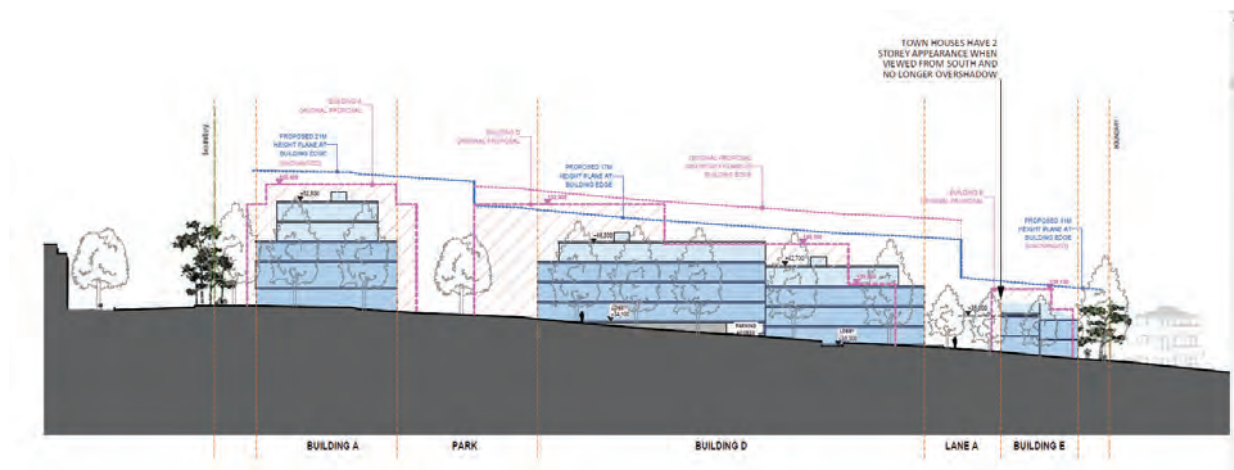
Proposed elevation along Alma Avenue (in blue) - Compared to Original Proposal (in pink)
